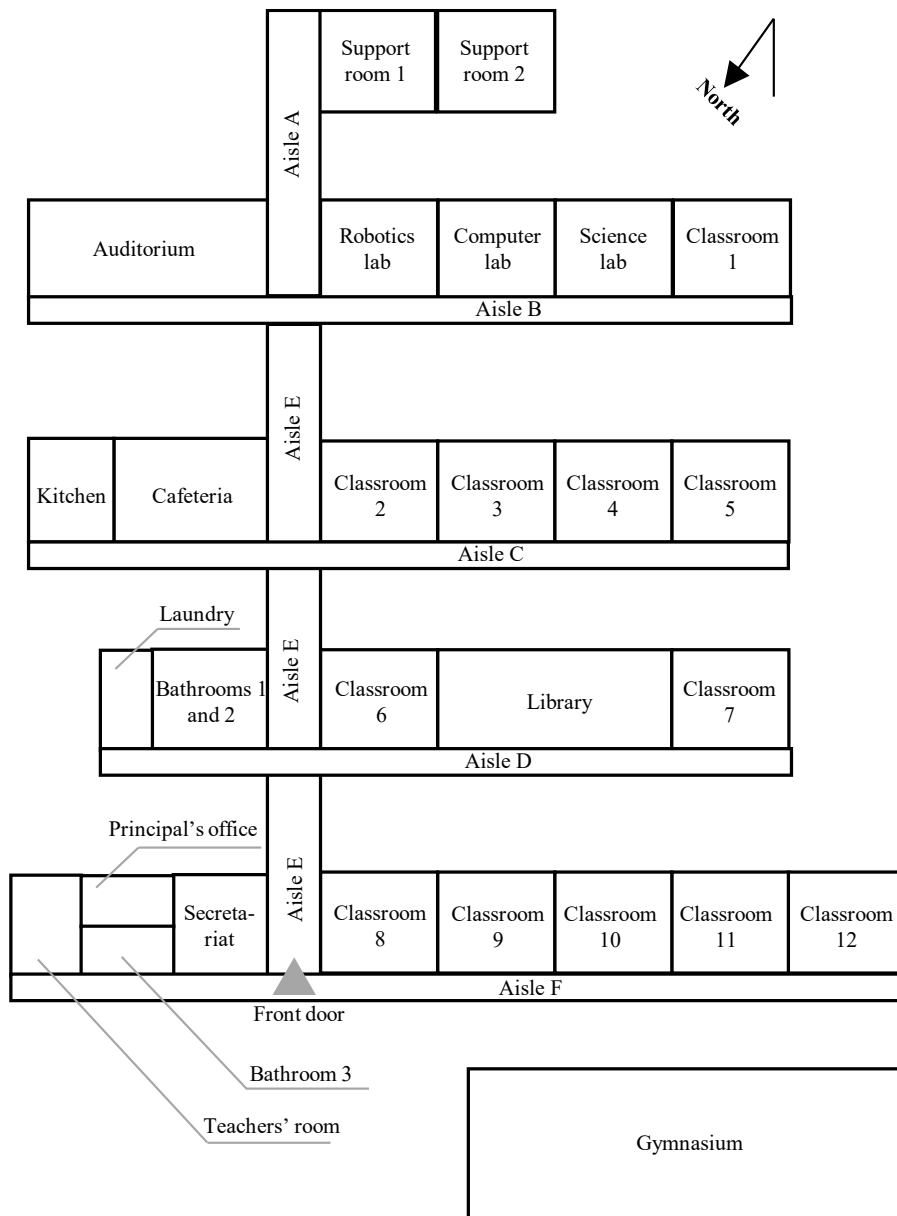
Schematic representation of the building floor-plan (no scale)
